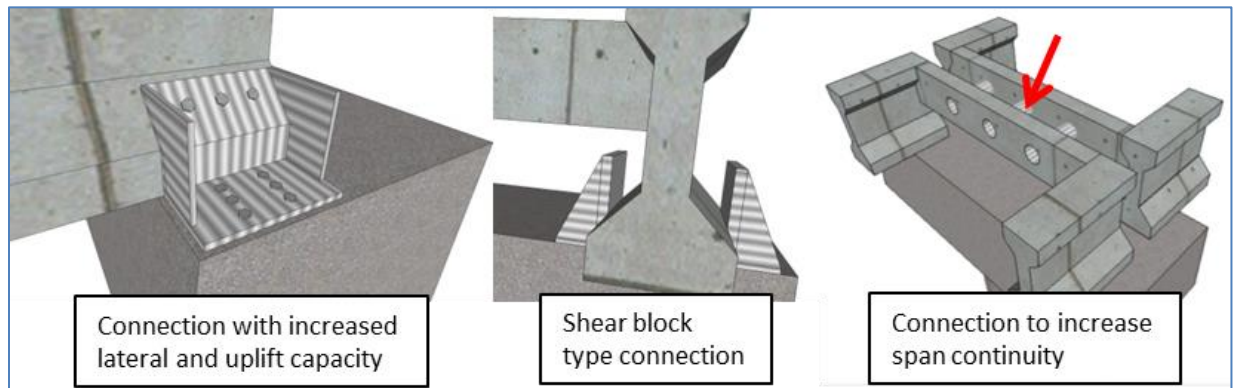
Examples of potential retrofit options for several of the adaptations considered: (a) strengthened connection to carry full loads, (b) strengthened connection to carry lateral loads (shear block), and (c) increased span continuity.
